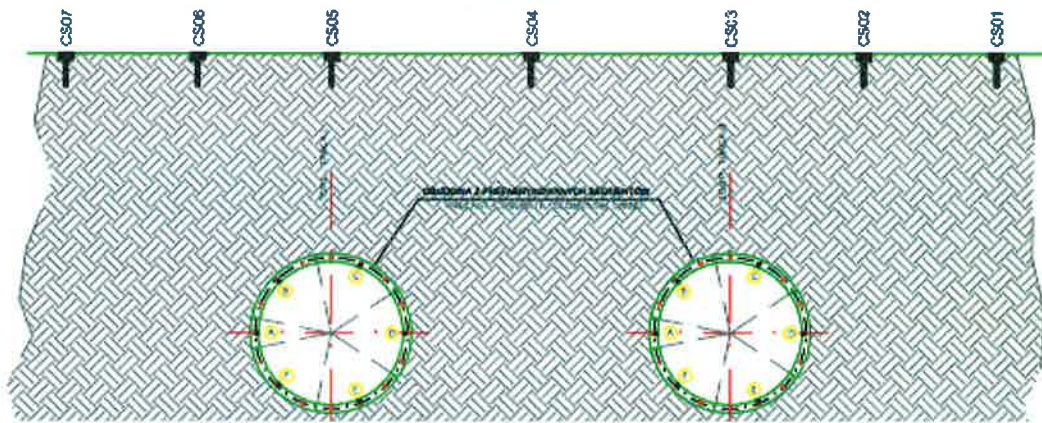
Tunnel Cross Section Showing Ground Pin Layout
